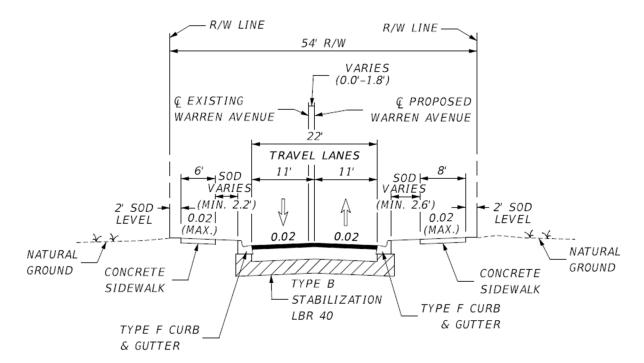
Alternative 2 Typical Section from 385 ft East of St Laurent Street to 500 ft West of Lemon Lane
